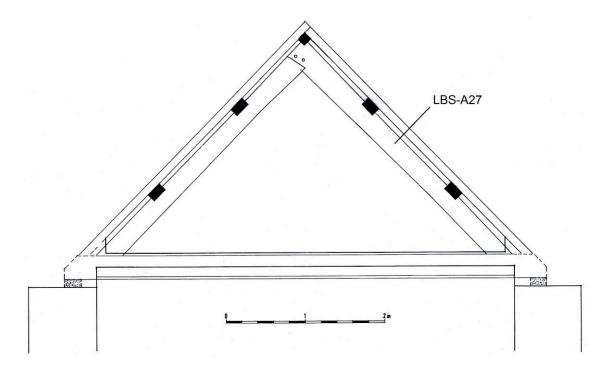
Central hall/parlour range; truss 2 (east face), showing the location of sample LBS-A27 (Martin Roberts)
